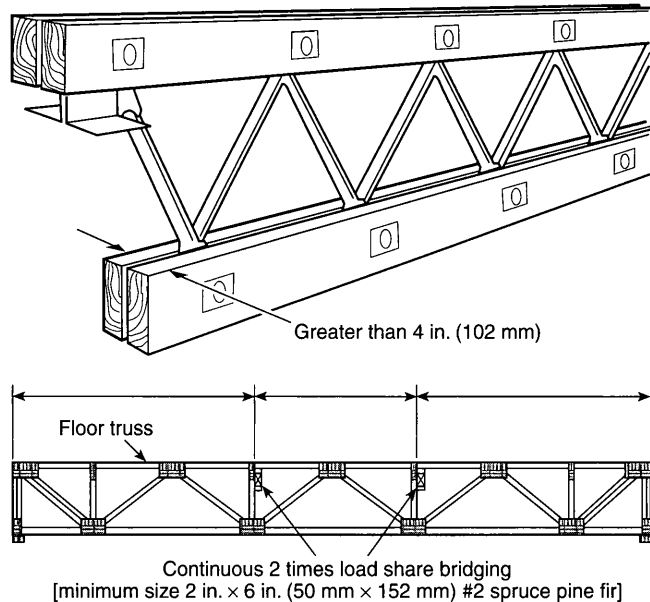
(c) Examples of Wood Truss Construction.
